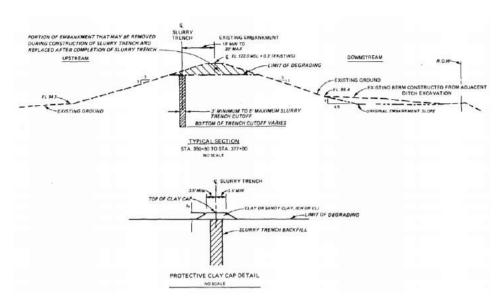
Addicks Dams remedial slurry trench for embankment and foundation seepage control [50]
